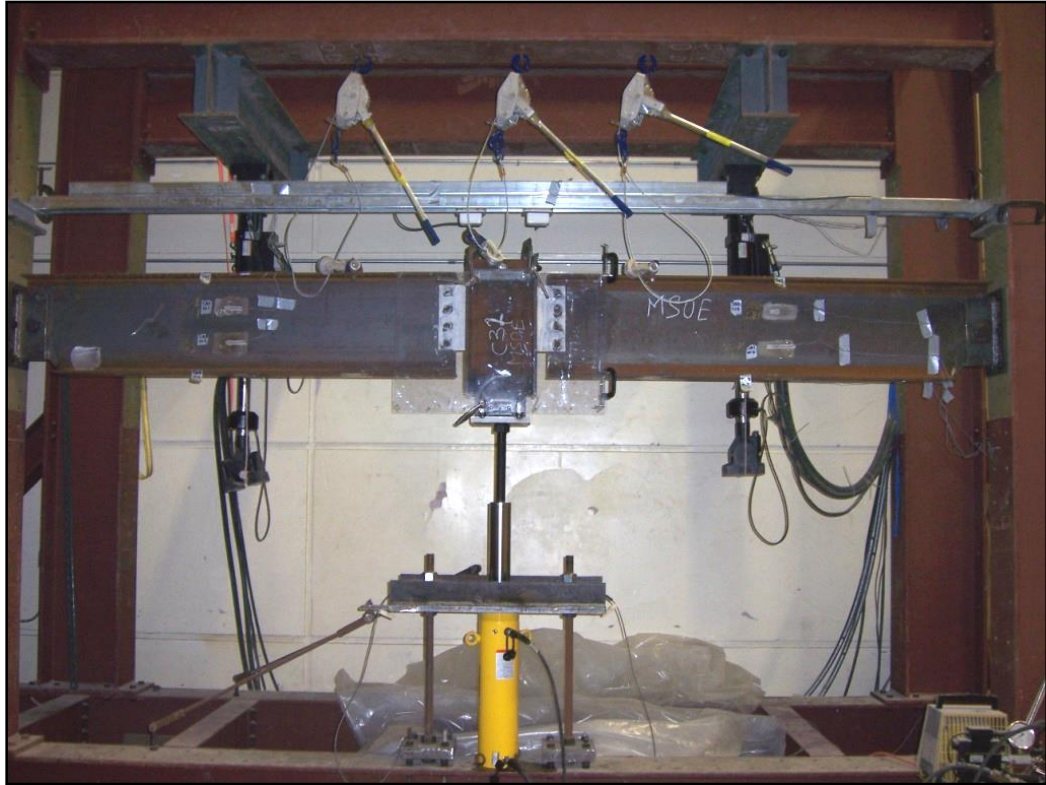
Typical Test System Configuration Prior to Testing [3].
